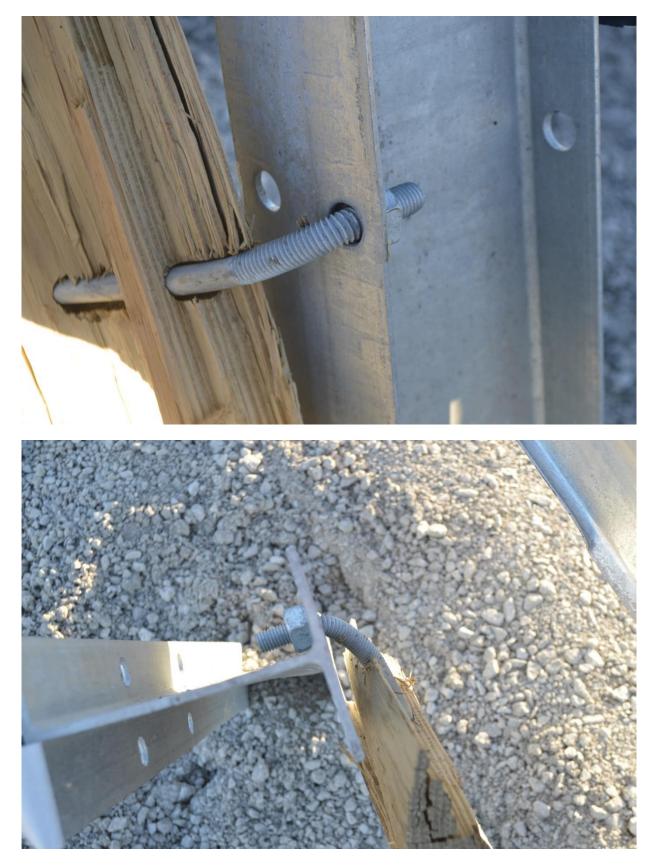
Bolt Damage. Test No. MGS7S-2
